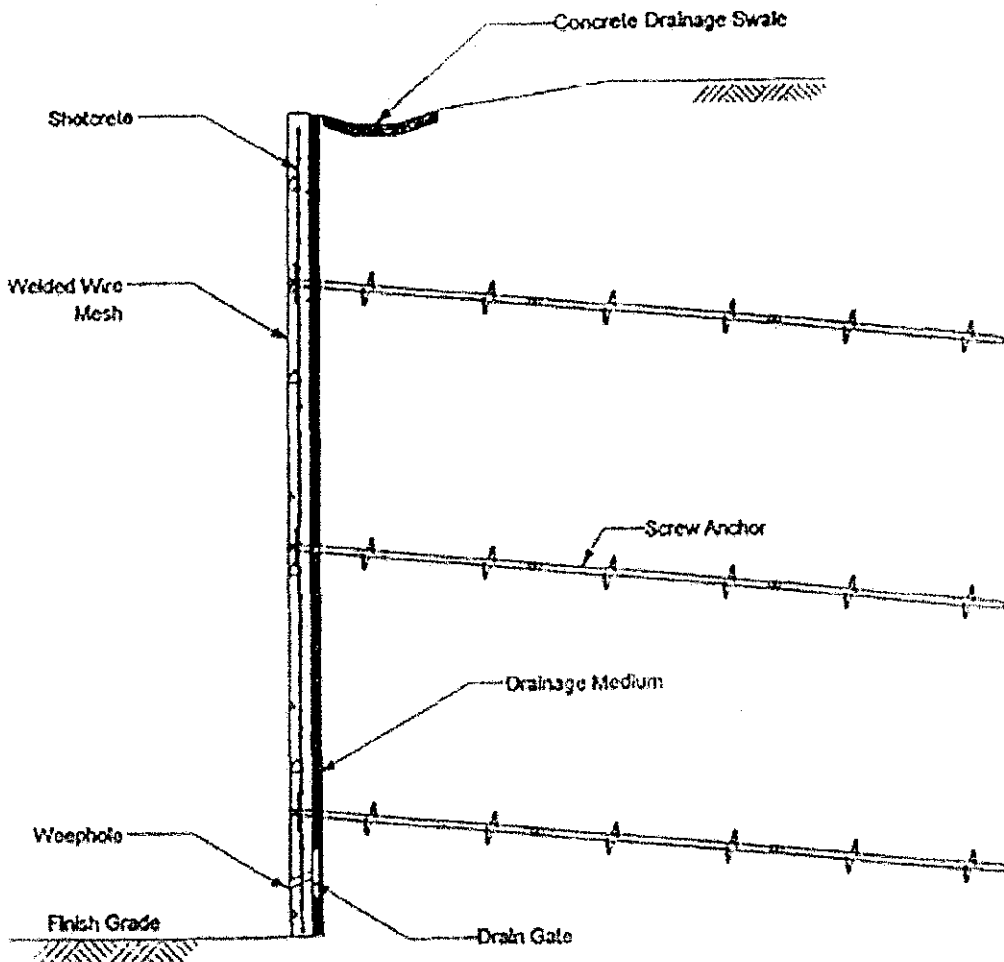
Concrete Drainage Swale (from: www.abchance.com)
